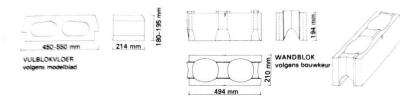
Concrete blocks used for load-bearing walls and floors (Priemus & Elk, 1971)
